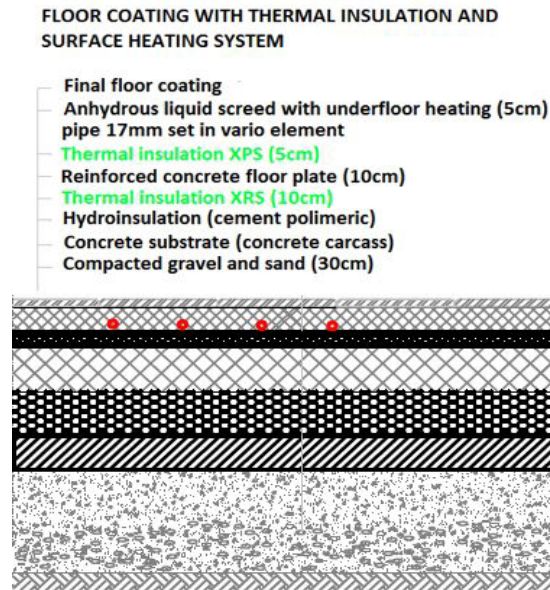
Illustration of the floor composition layers and the system for underfloor heating
